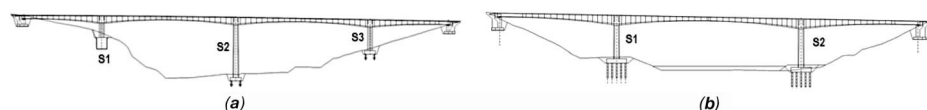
(a) Vranduk 1 Bridge longitudinal section. (b) Vranduk 2 Bridge longitudinal section
